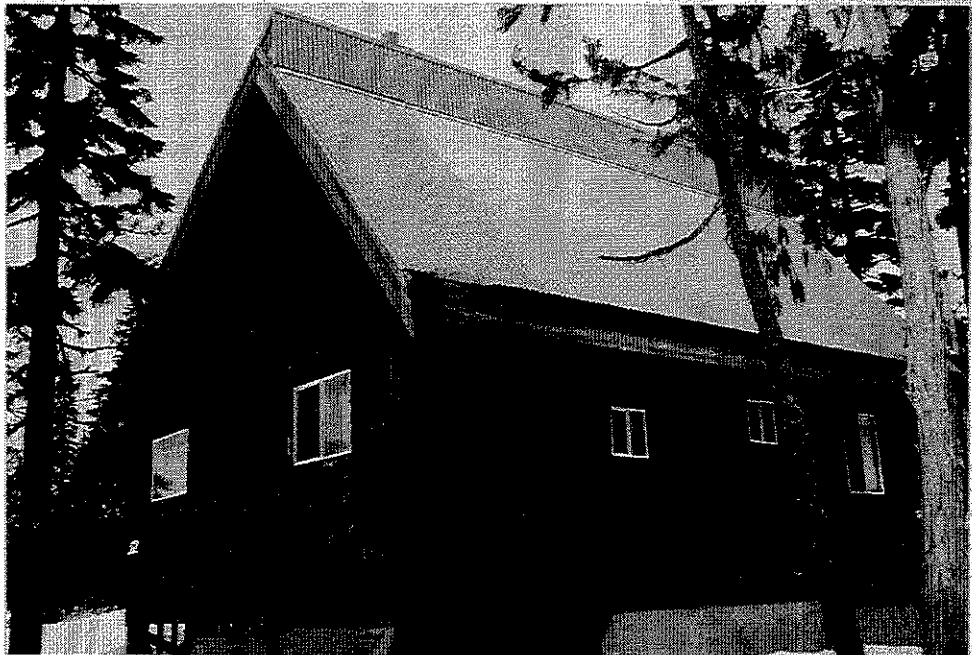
Roof designed to prevent 'hat' of snow from balancing at ridge. The special ridge will force the snow cover to crack and slide off.
